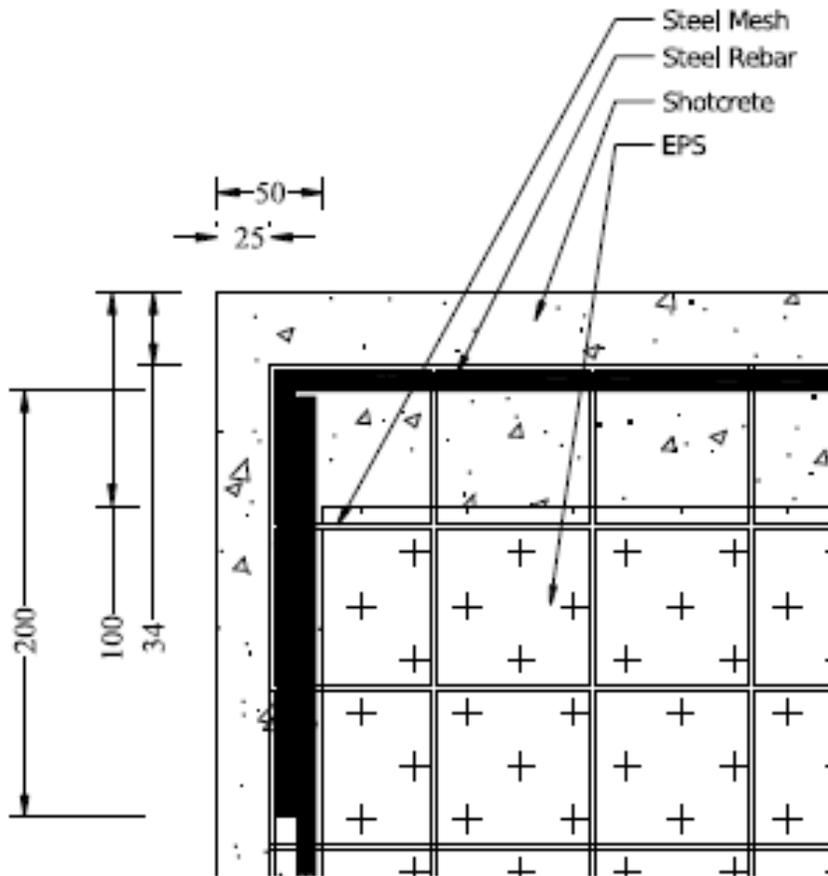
TYPICAL WALL PANEL TO ROOF PANEL CONNECTION DETAIL
